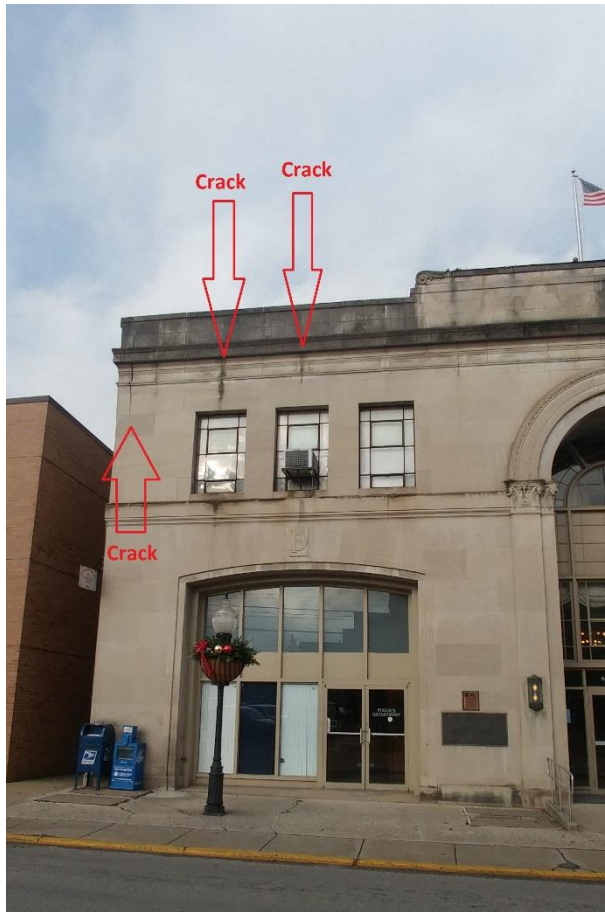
Stress cracks in the facade due to the detachment of the parapet from the building.
